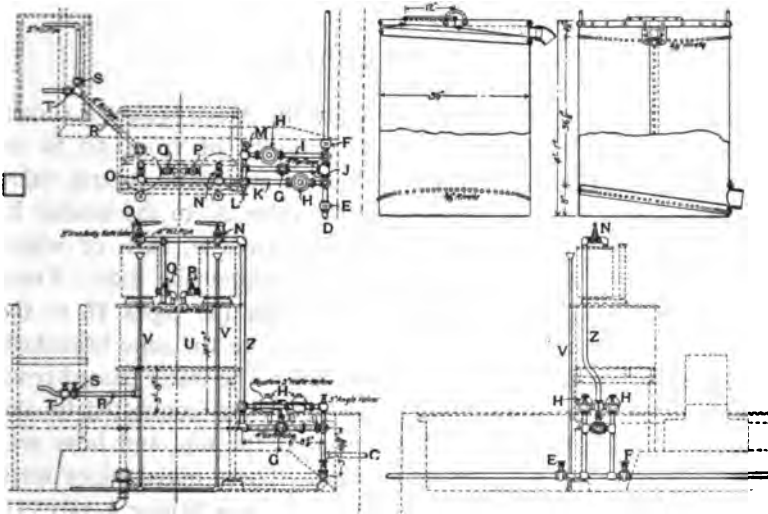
Feed Water Piping Arrangement and Water Tanks.
